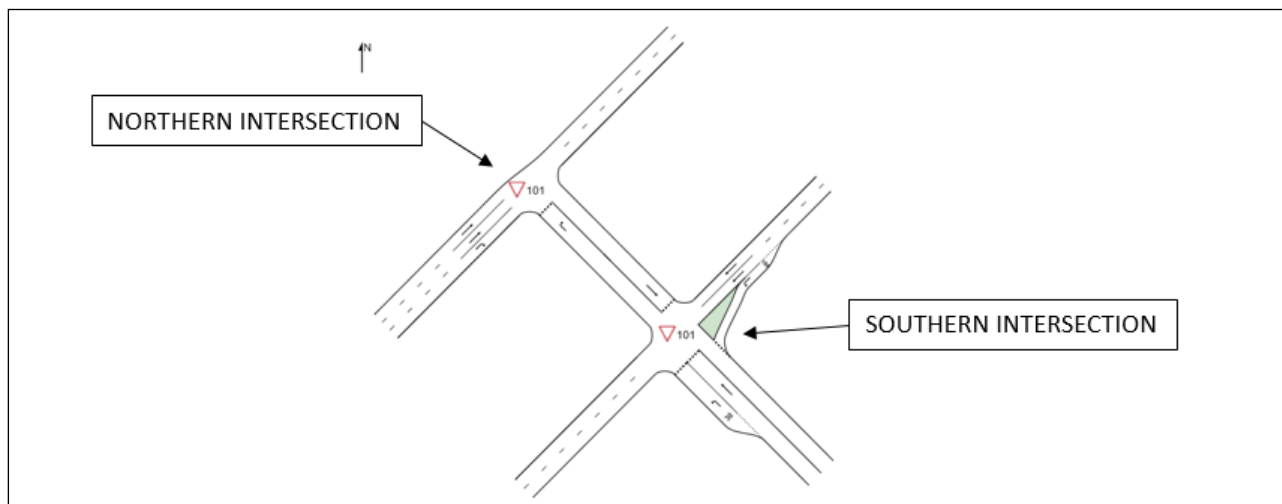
SIDRA Geometry: Monaro Highway / Tralee Street – Existing Layout
